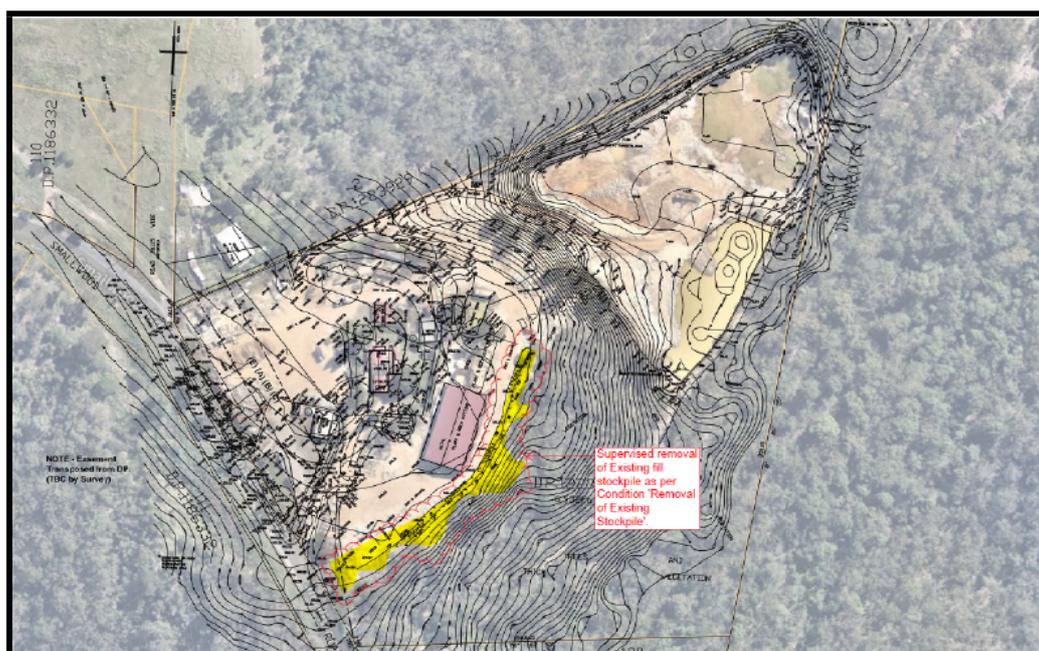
Existing fill stockpile to be removed (Source: Sheet 2, PGH set)
